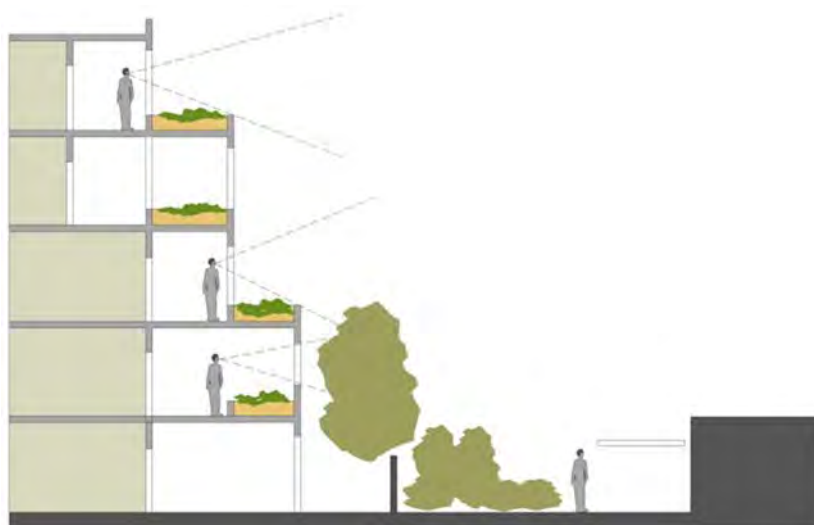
This section shows two ways of preventing overlooking of adjacent private open space. At ground level, dense landscaping will provide privacy up to the first floor. Above this the position of the viewer can be set back from balcony edges by using wide planter boxes which that are shallow enough to allow good outlook but wide enough to offer privacy to neighbours. A step in the building may be required as the height increases.
